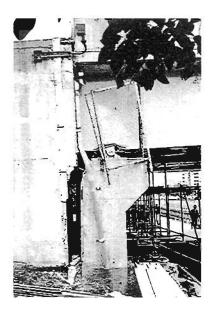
Footbridge over Canal, Kobe lateral spreading caused banks to move inwards, and girder sliced through roadway
